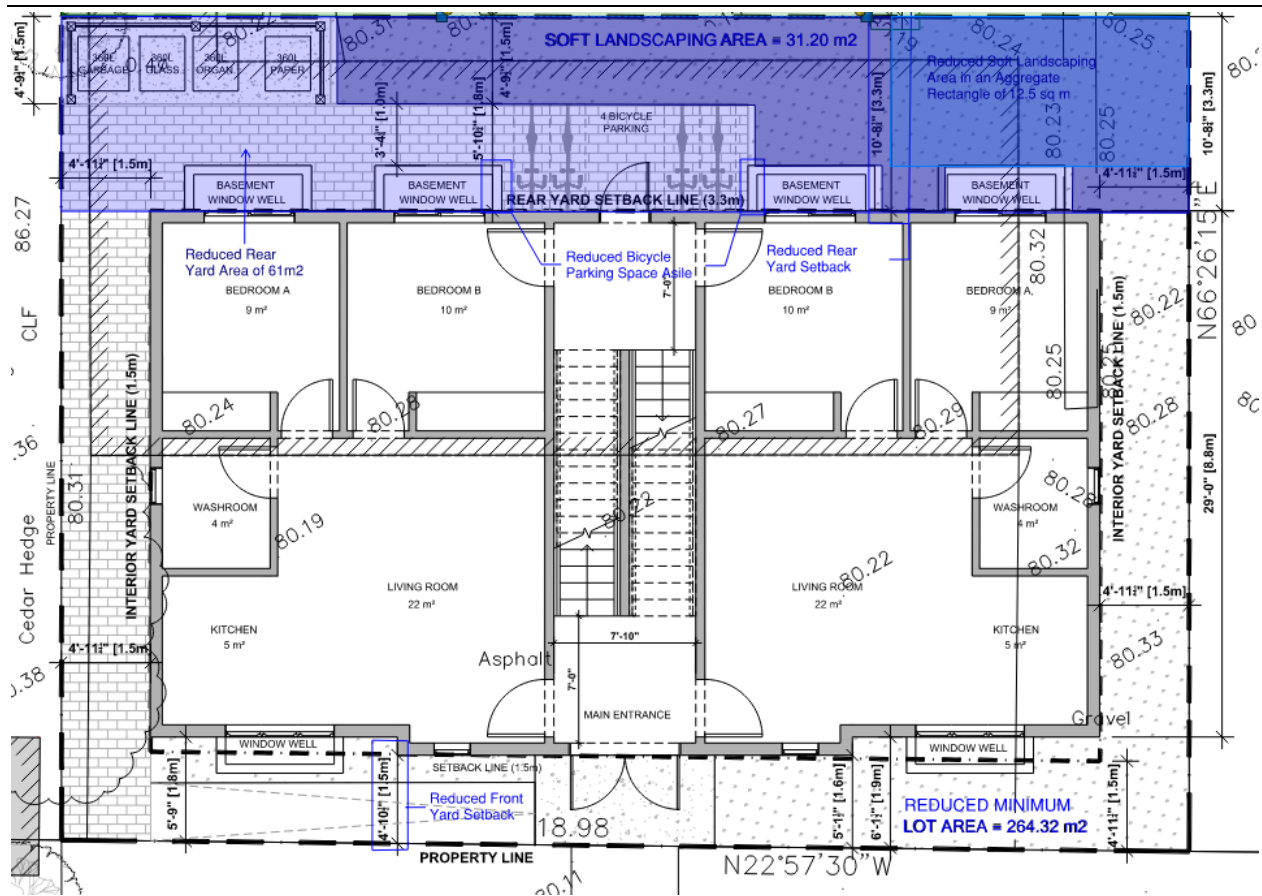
Site Plan of Proposed Development Outlining Minor Variances for Lot A
